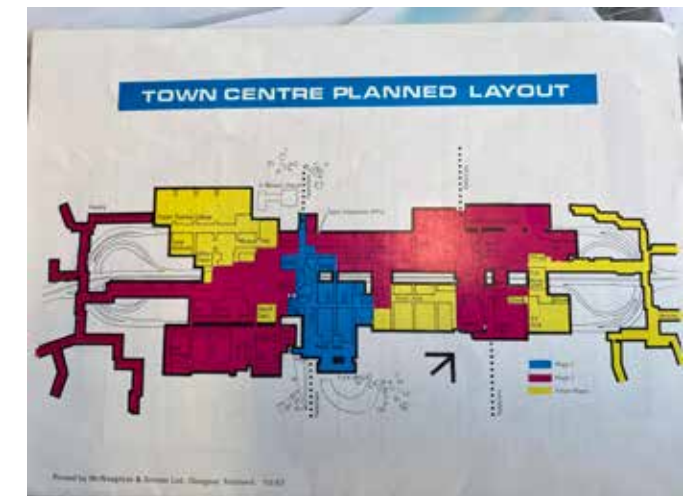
Plan of the intended layout from 1967 CDC booklet
